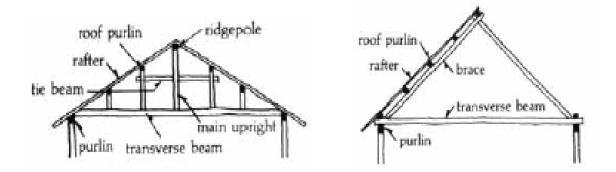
Japanese truss (Wagoya-gumi) (left) and brace truss (Sasu-gumi) (right) (Source: Piccinini, 2003)
